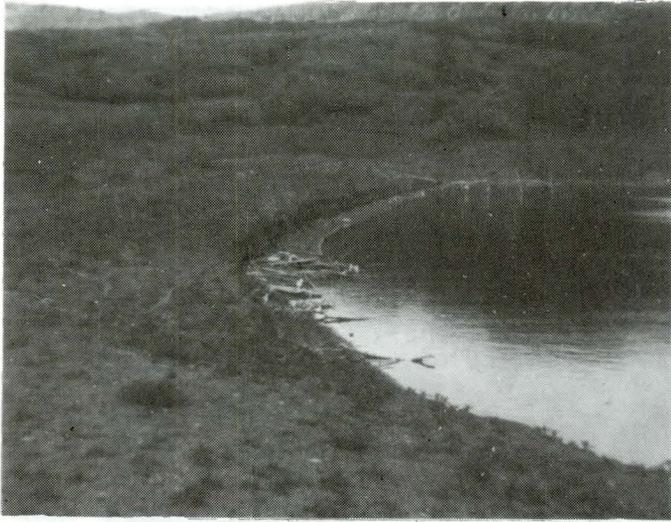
EROSION AT UPSTREAM FACE
